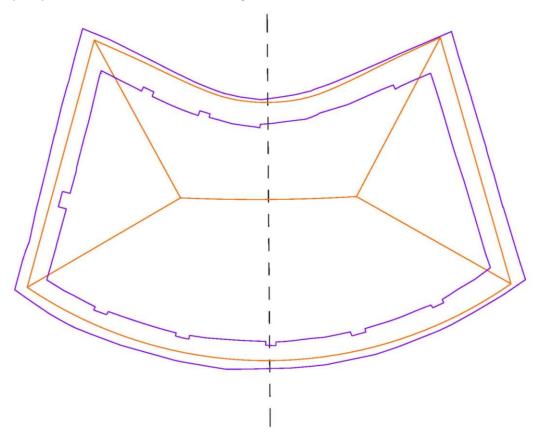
The final new symmetrical roof contour. Source: own ill.
